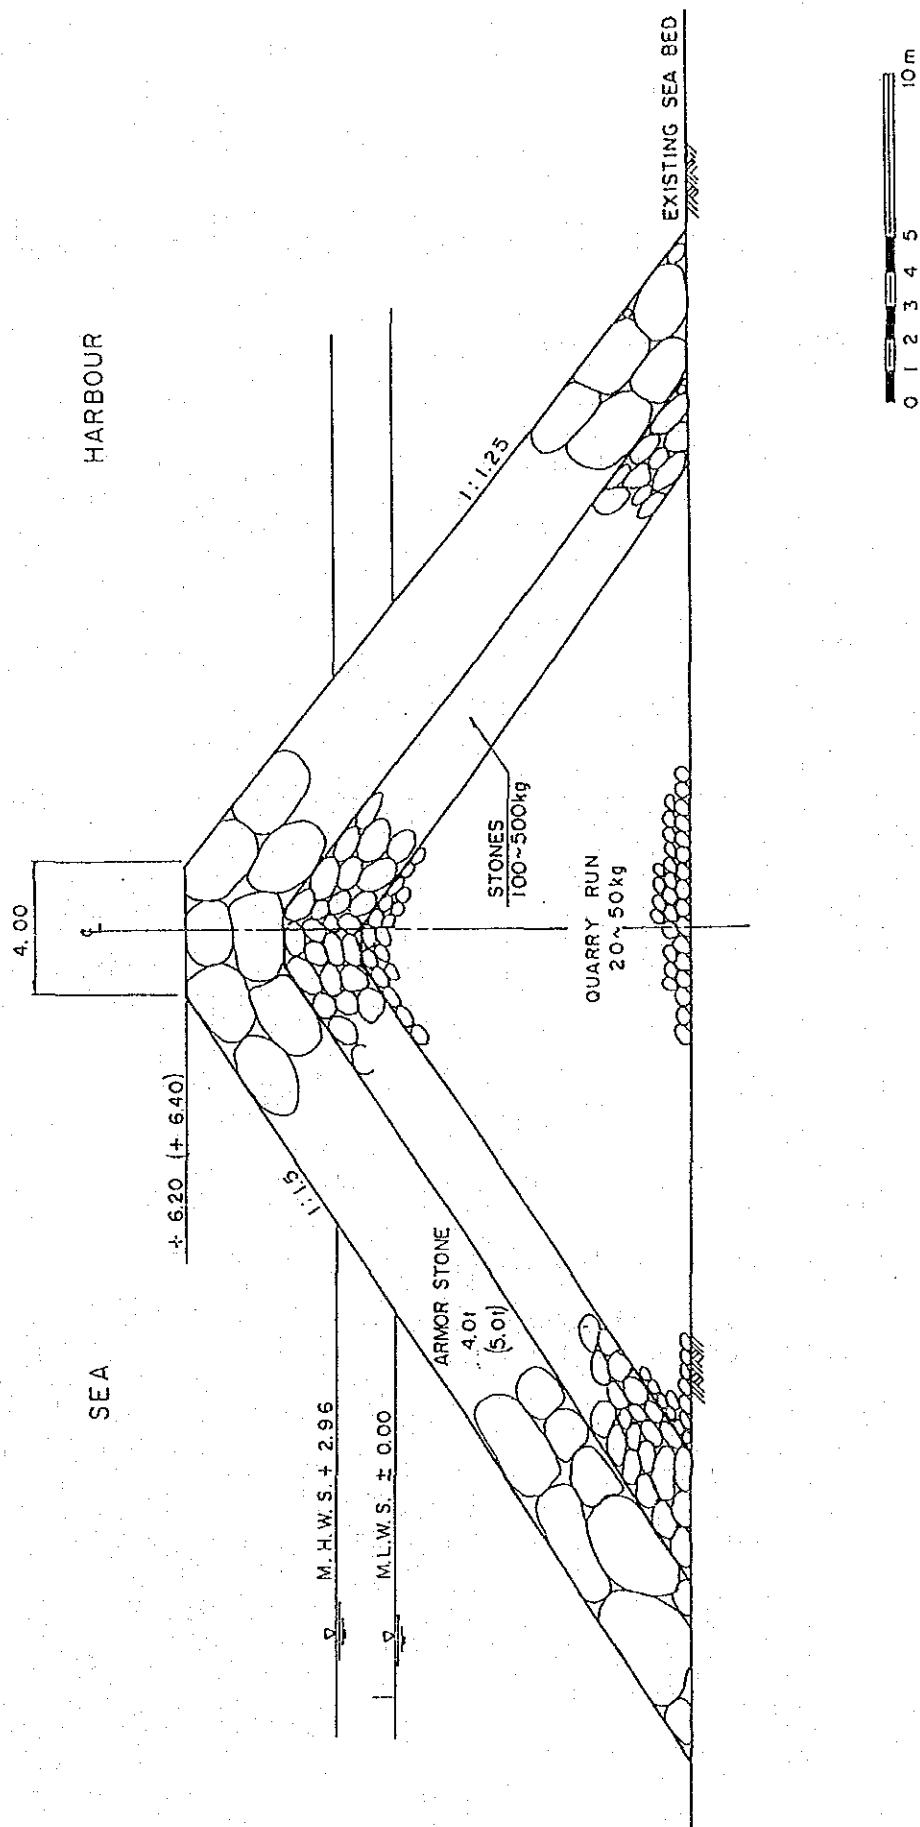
(2) Typical Cross Section of Breakwater(2)
